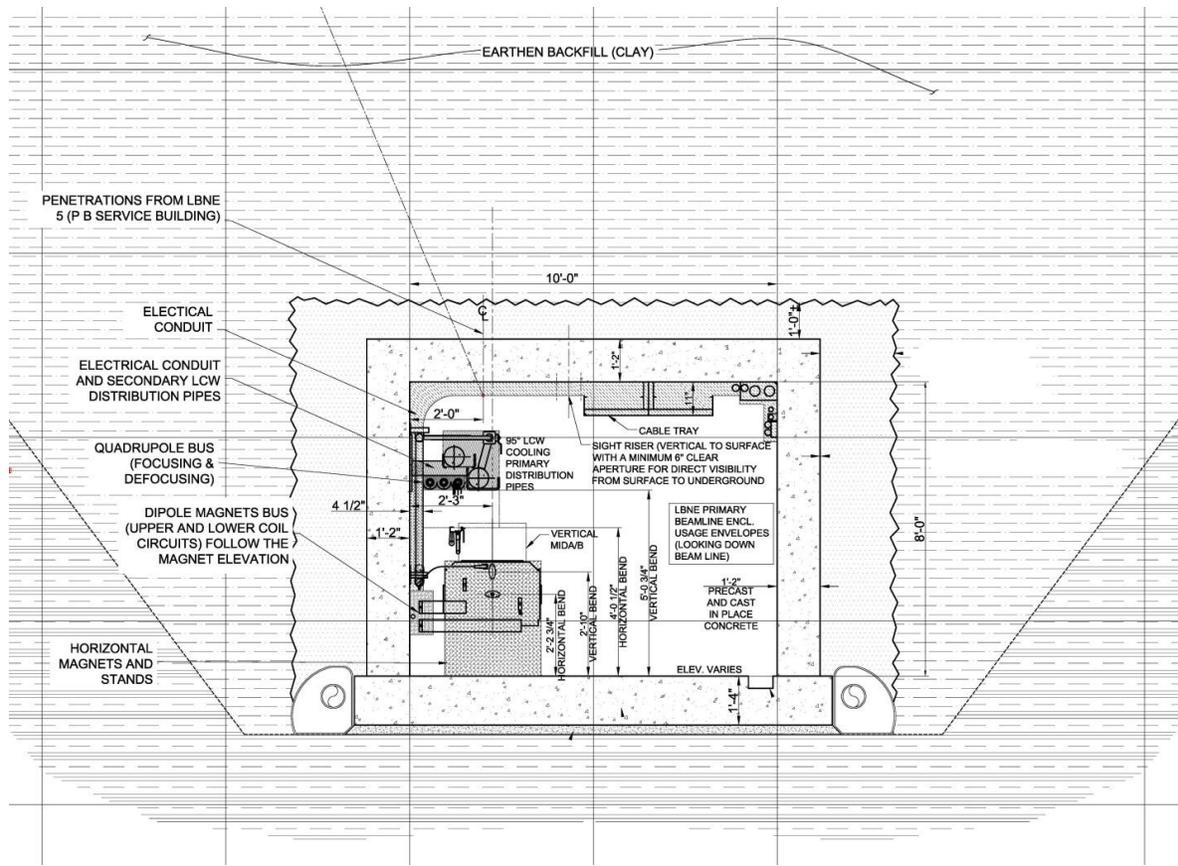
Primary Beam Enclosure showing technical components, typical enclosure section.
